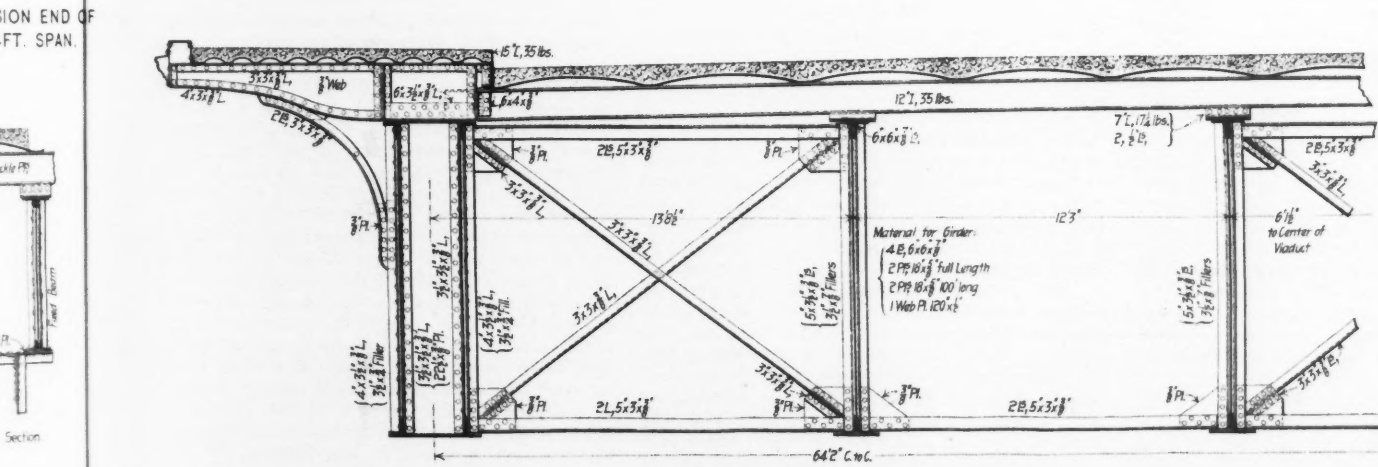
HALF TRANSVERSE SECTION OF MAIN GIRDERS AND FLOOR SYSTEM OF 130-FT. SPAN.
